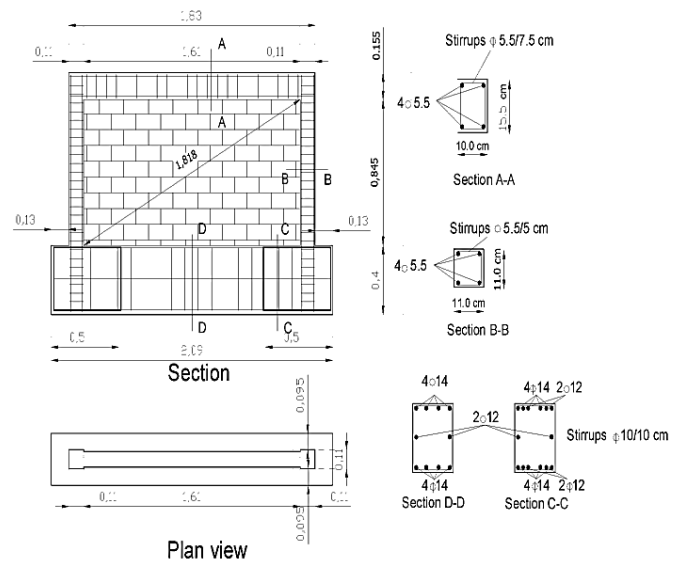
Masonry infilled R/C frame specimen and design details F2N
